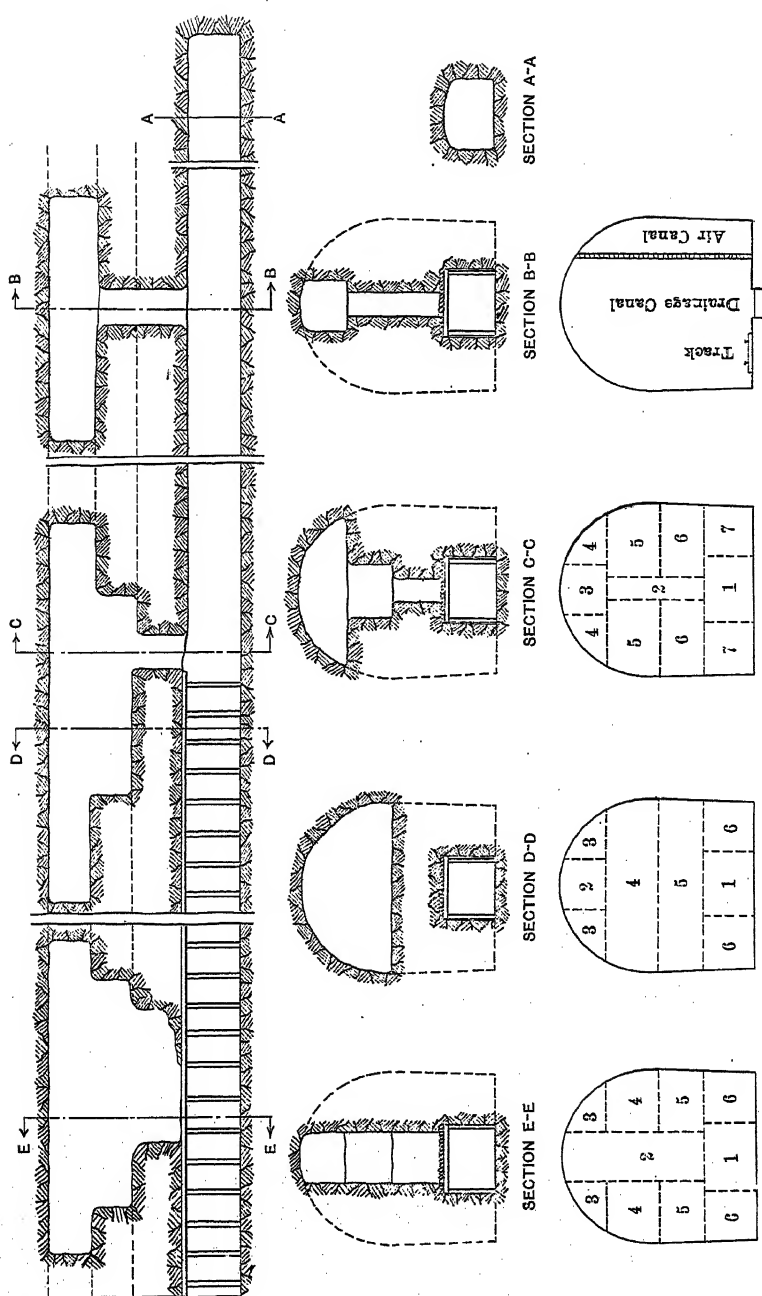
LONGITUDINAL AND CROSS-SECTIONS, SHOWING METHODS OF EXCAVATING.
